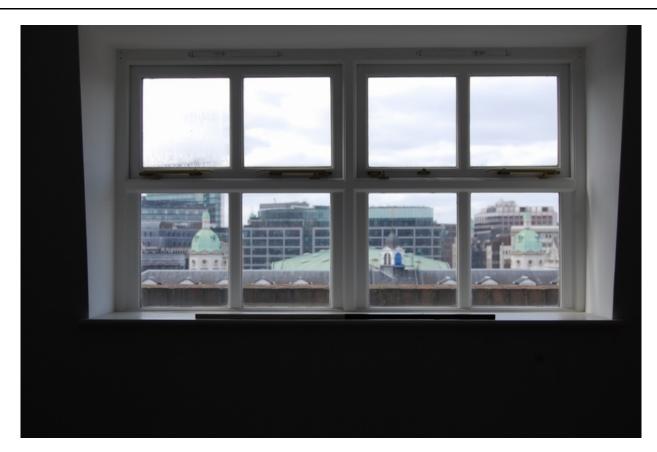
8-9 Hayne Street, modern window detail to attic storey
